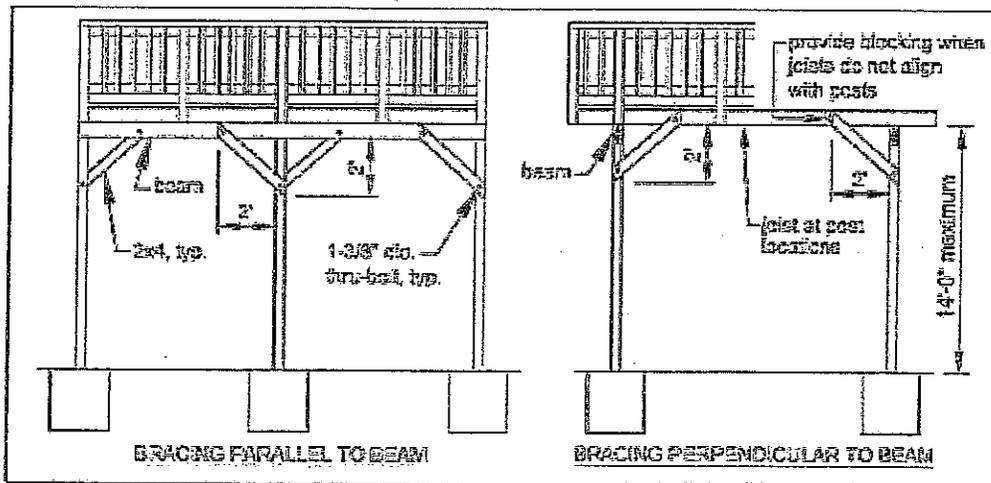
DIAGONAL BRACING REQUIREMENTS
